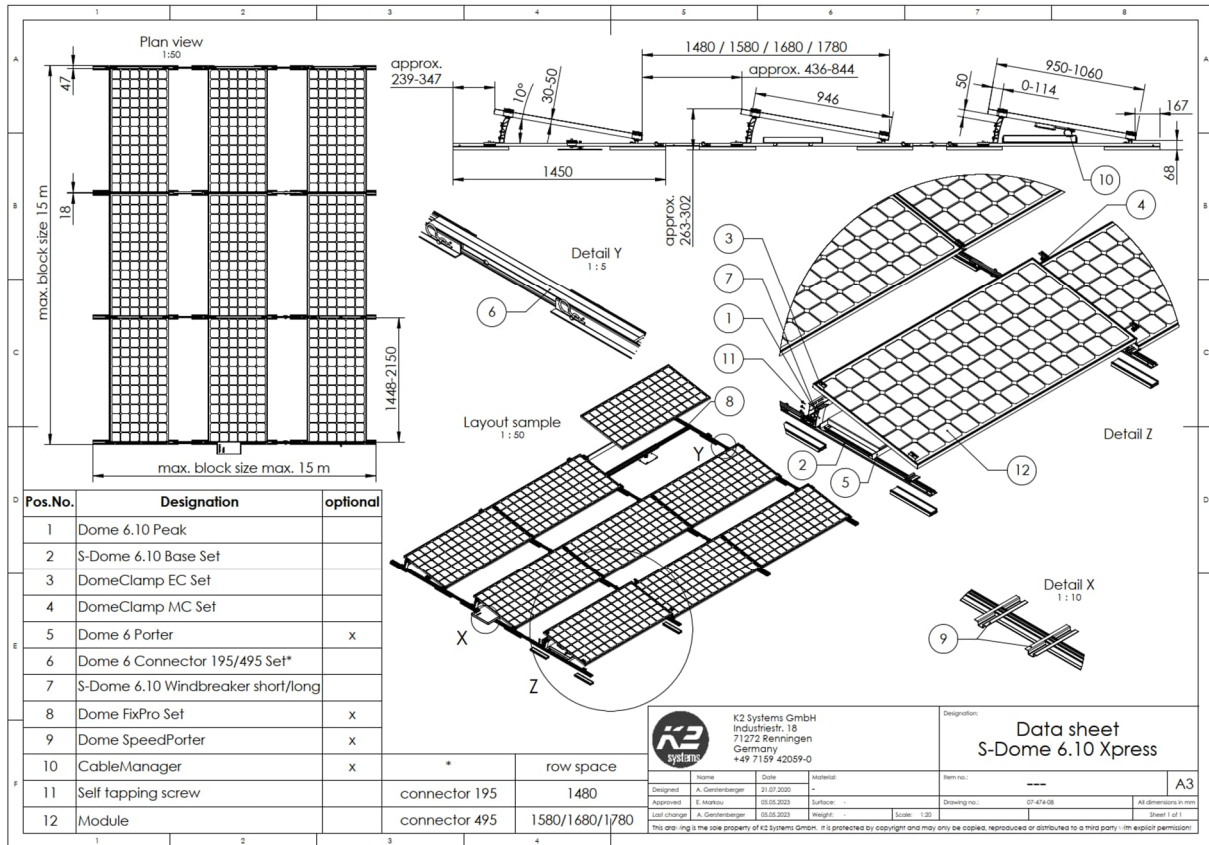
System data sheet for the "S-Dome 6.10 Xpress" solar ballasted roof mount system
